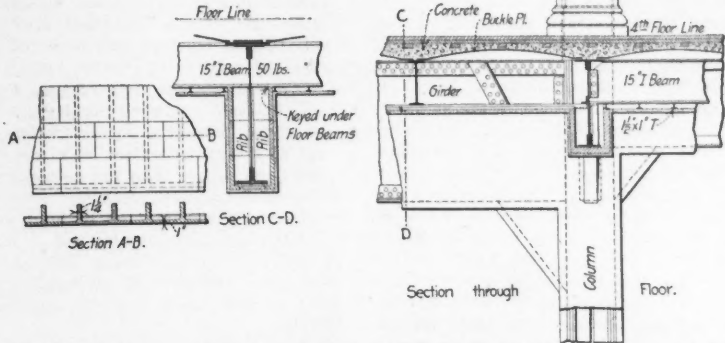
DETAILS OF FLOOR CONSTRUCTION AND COLUMN AND GIRDER FIREPROOFING, U. S. APPRAISERS' WAREHOUSE, NEW YORK.
